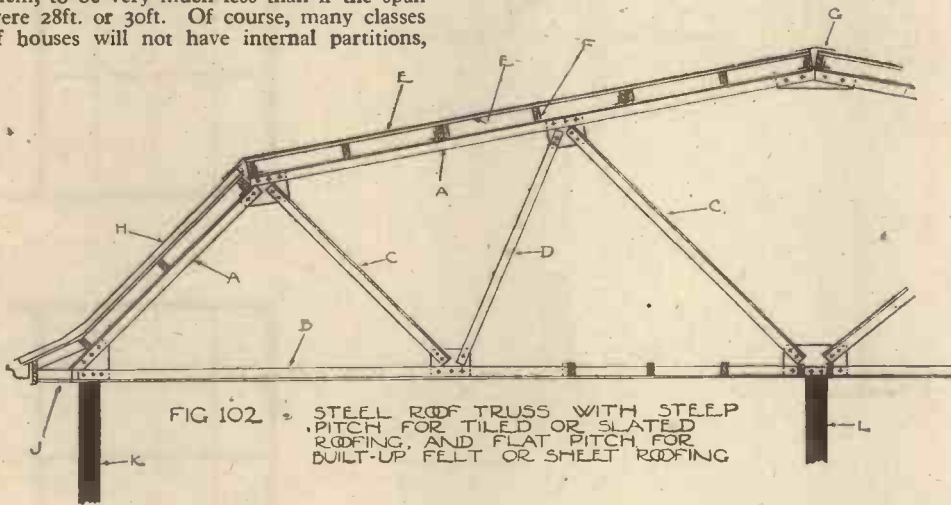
STEEL ROOF TRUSS WITH STEEP PITCH FOR TILED OR SLATED ROOFING, AND FLAT PITCH FOR BUILT-UP FELT OR SHEET ROOFING
